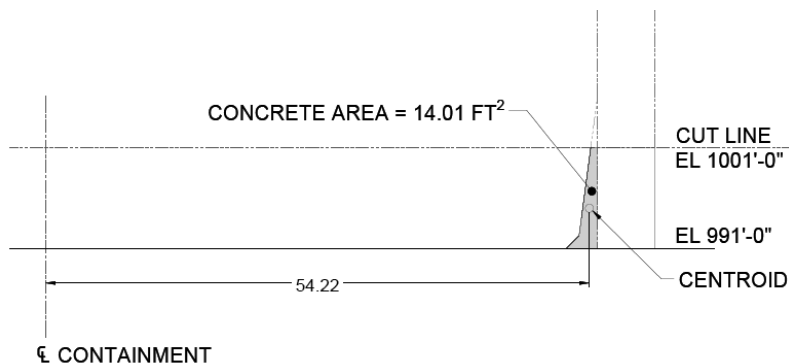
Sloped Portion of Containment Walls Cross Sectional Area
